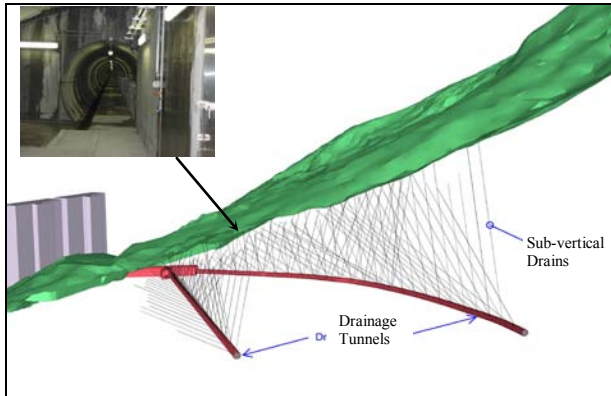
Construction of two drainage tunnels at Po Shan natural hillside, Hong Kong
